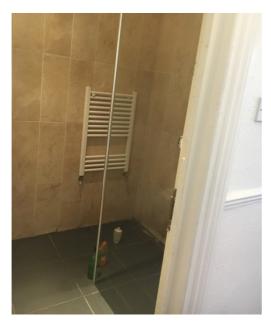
Two historic rooms have been subdivided to create three bedrooms, a hallway and a wet room.
